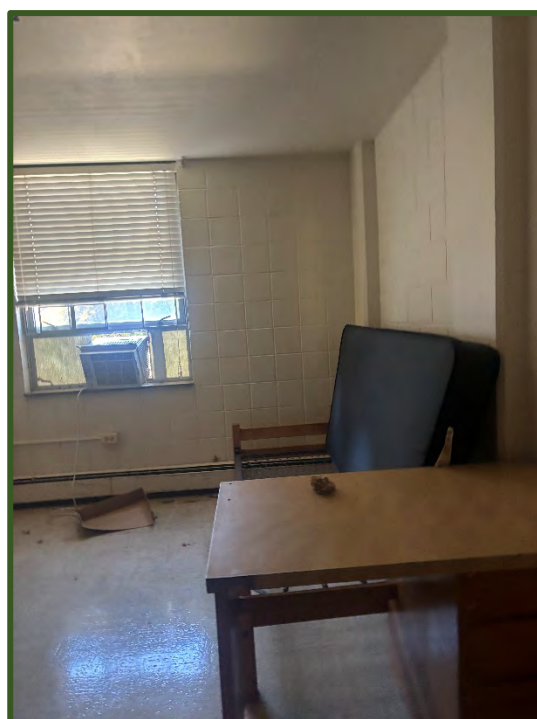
Lack of central air conditioning in Dayton Hall, with built-in wall unit.
